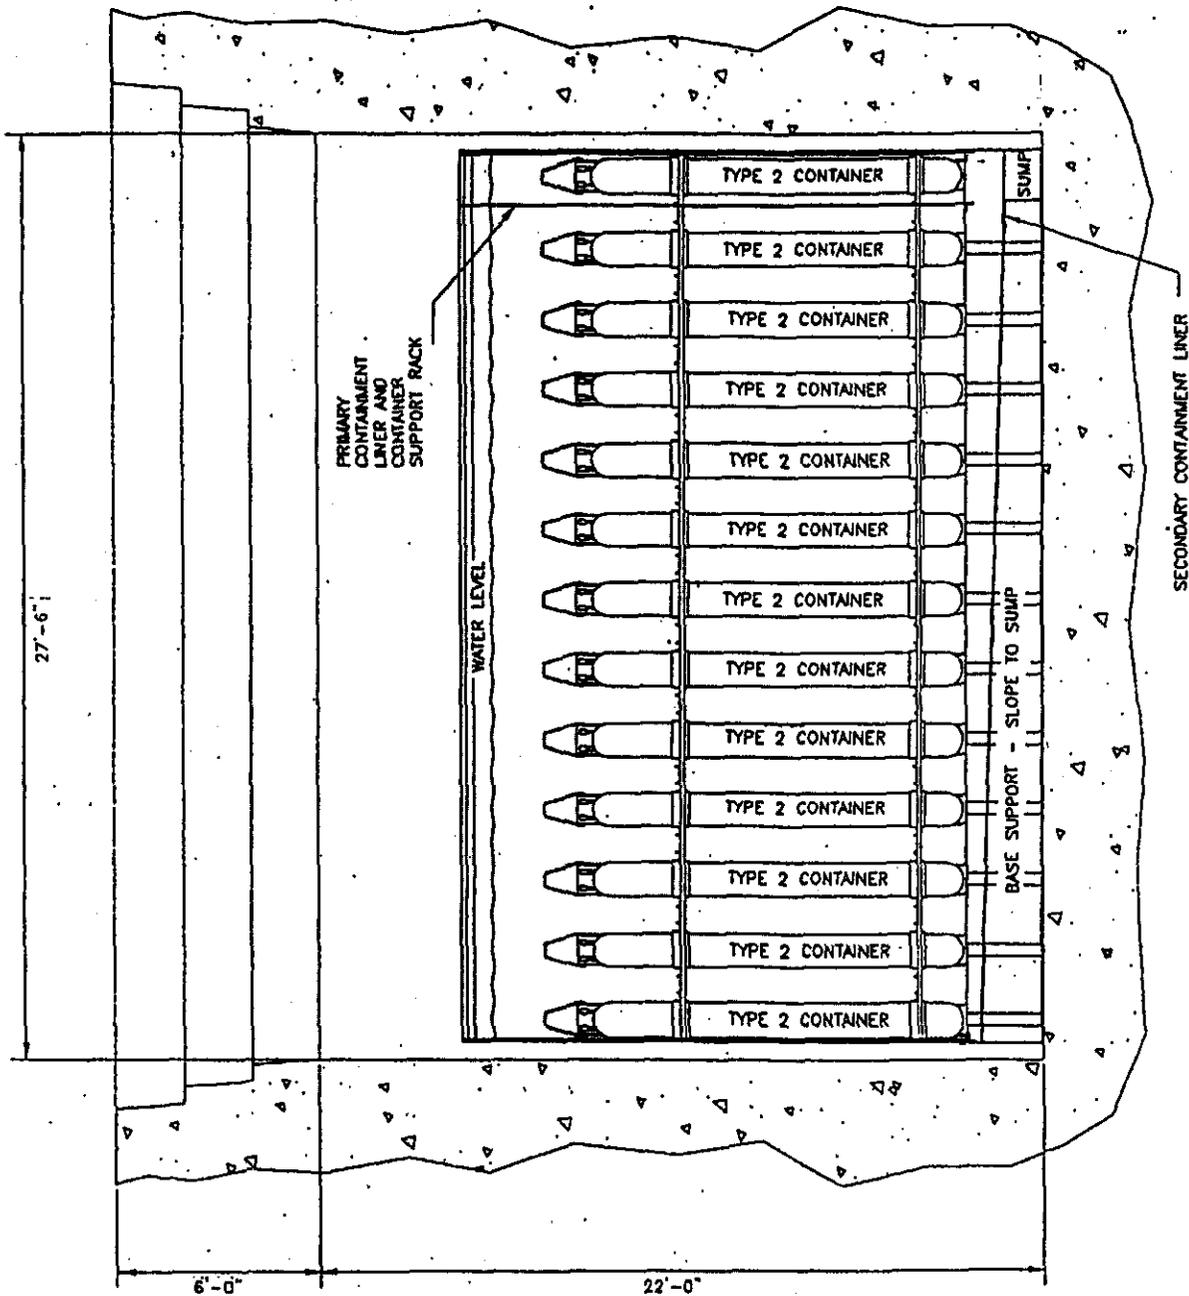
Typical Arrangement Type 2 Containers in Container Storage Rack for Pool (Side View).
